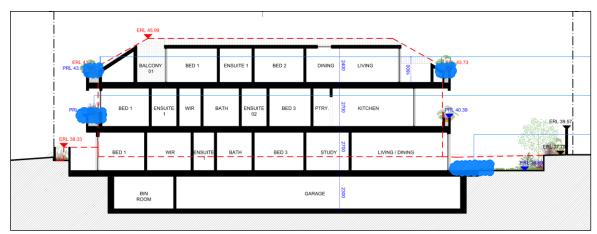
Proposed Long Section (source: Common Office, dated 29/05/2025)
